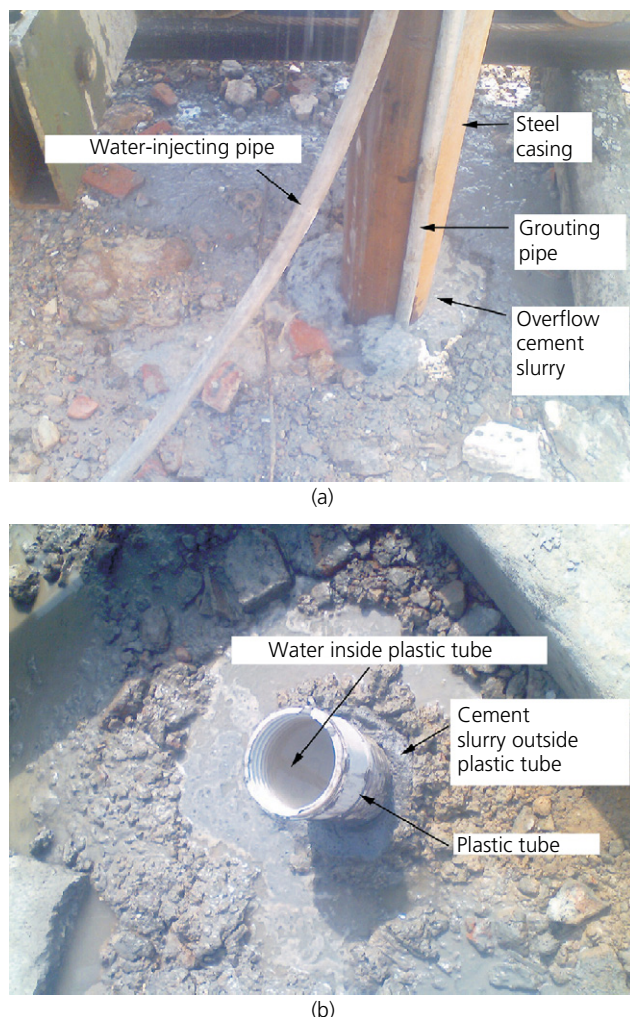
Pre-grouting of an SGTC pile: (a) grouting and water injecting; (b) completing the grouting and water injection
